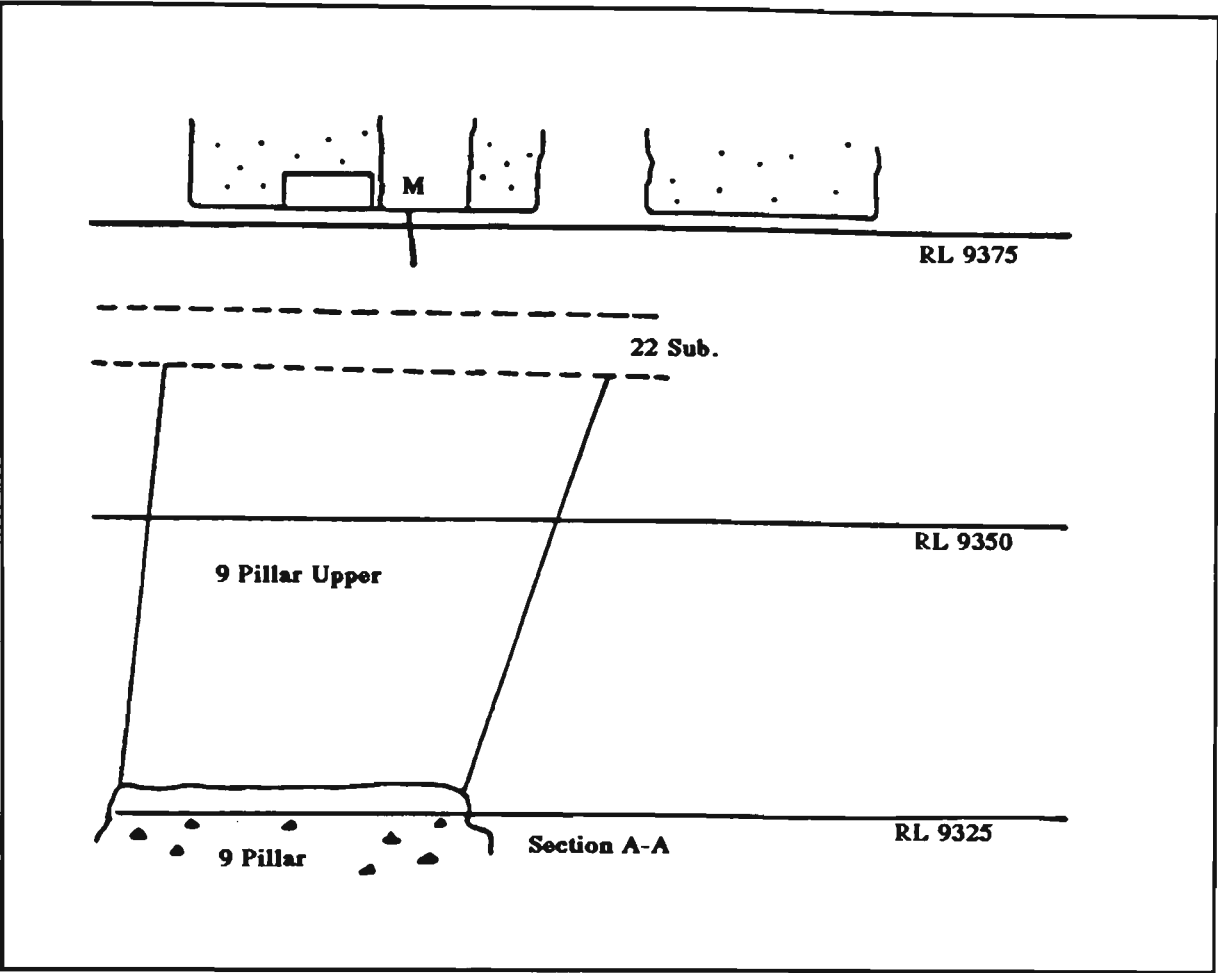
Longitudinal section of stress measurement site in 9 pillar upper stope
